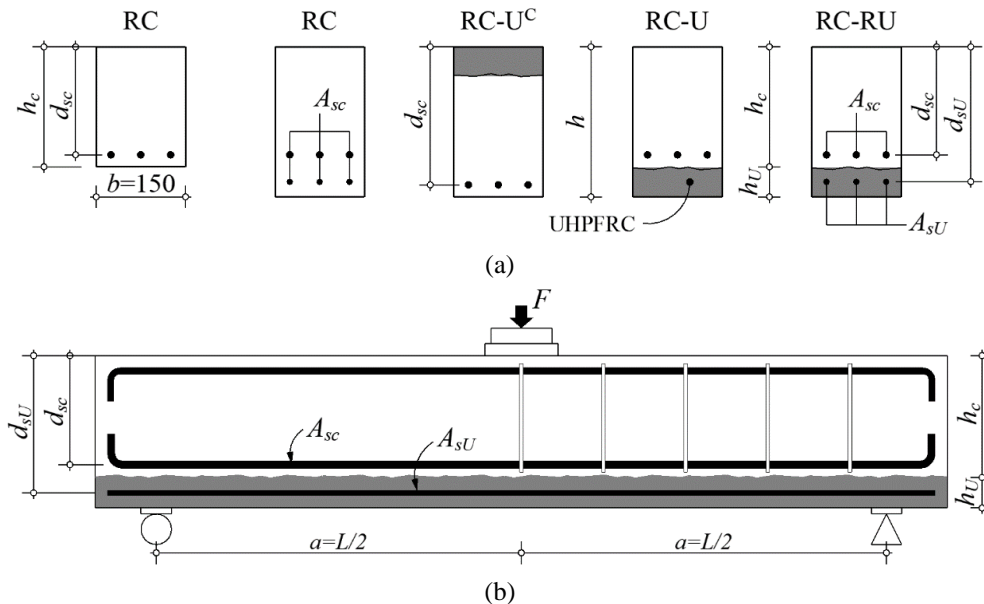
Tested beams: (a) cross-sections type and (b) three-point bending test setup.
